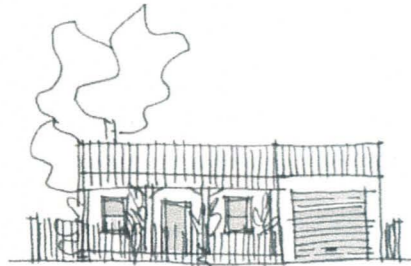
A bad example of infill design where garages are incorporated into the dwelling in line with the front of the building.
